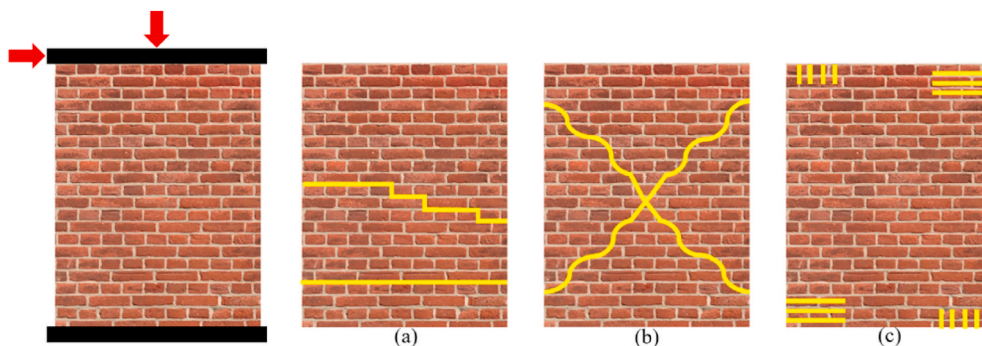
Crack patterns of a URM wall subjected to axial and lateral loadings for the shear sliding (a) diagonal cracking (b), and rocking (c) failure modes [21].
